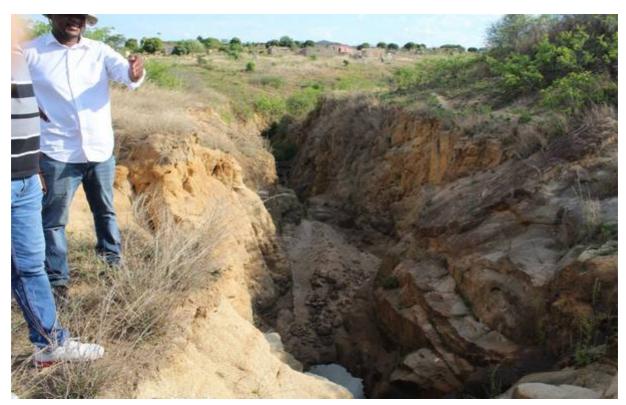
Delegates inspecting the large donga below the spillway of Casteel Dam.
